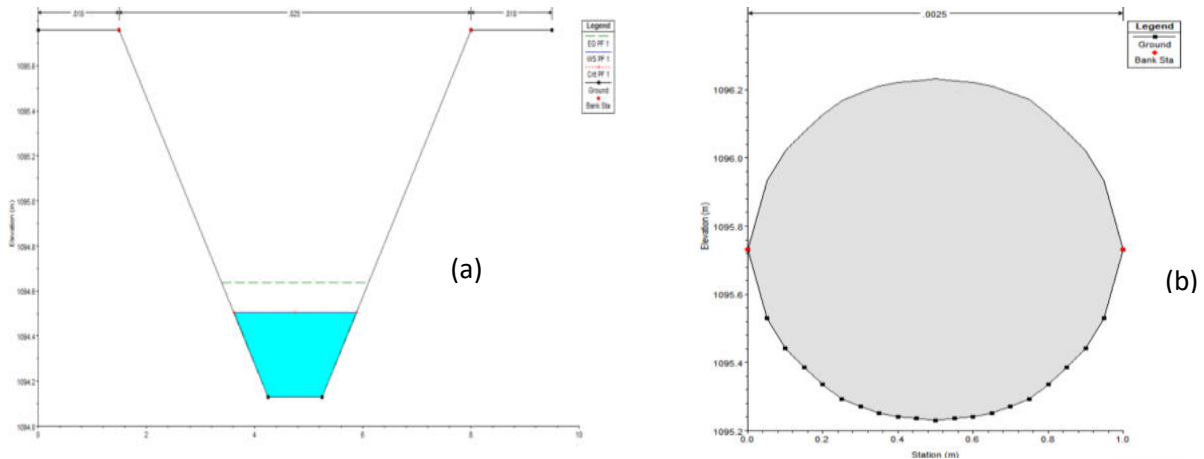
Typical open canal cross-section (a) and lidded cross-section (inverted siphon)(b)
